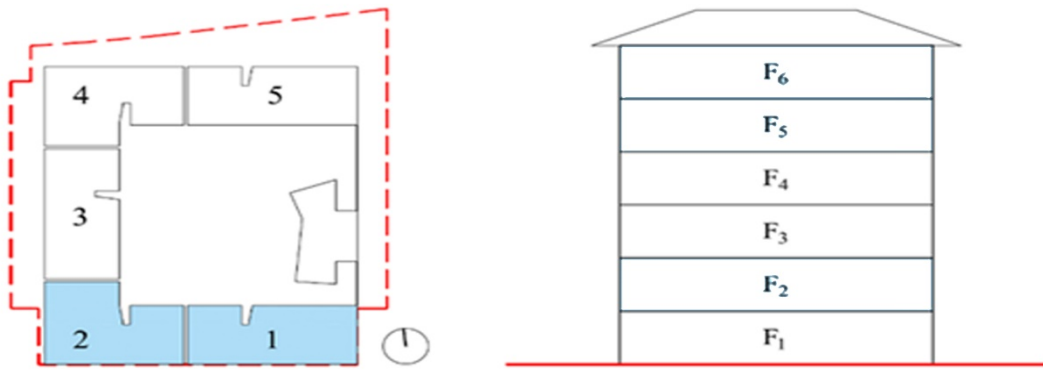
Disposition of buildings in the residential complex and section of the analyzed part.
